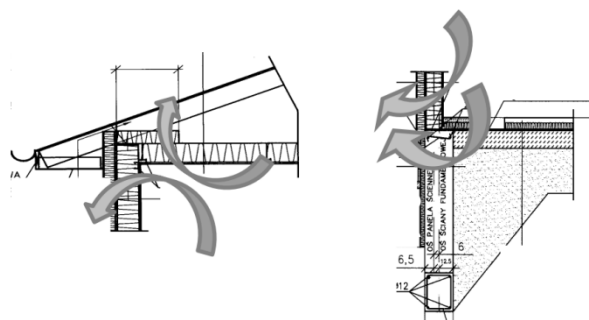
Details of the connection: a) walls with a roof b) walls, foundations and floors
